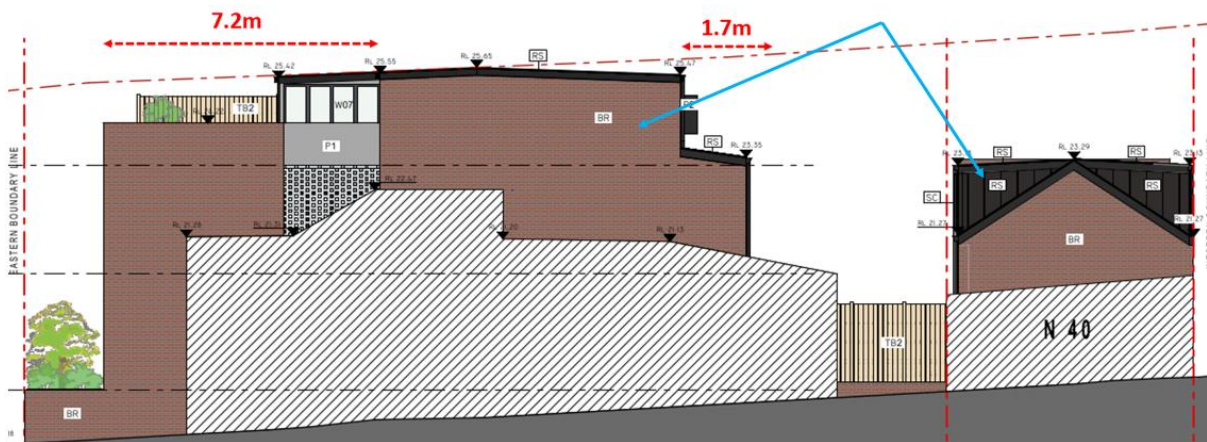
Extract from amended north elevation plan, showing masonry elevation. The third storey is setback from the eastern boundary (4.7-7.2m) and from the rear building line of the dwelling (1.7m).
